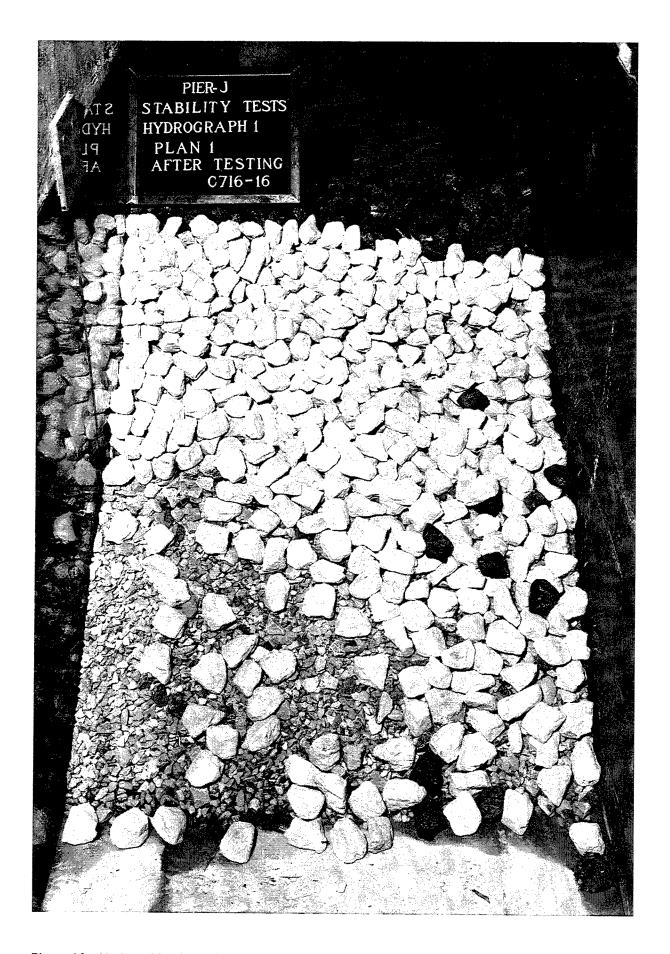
Harbor-side view of Plan 1 at the conclusion of testing
